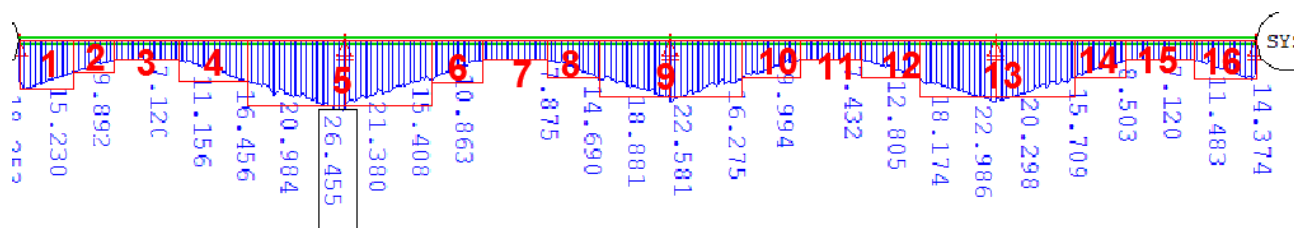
Division of analyzed stirrup reinforcement, segment phase, concrete variant
